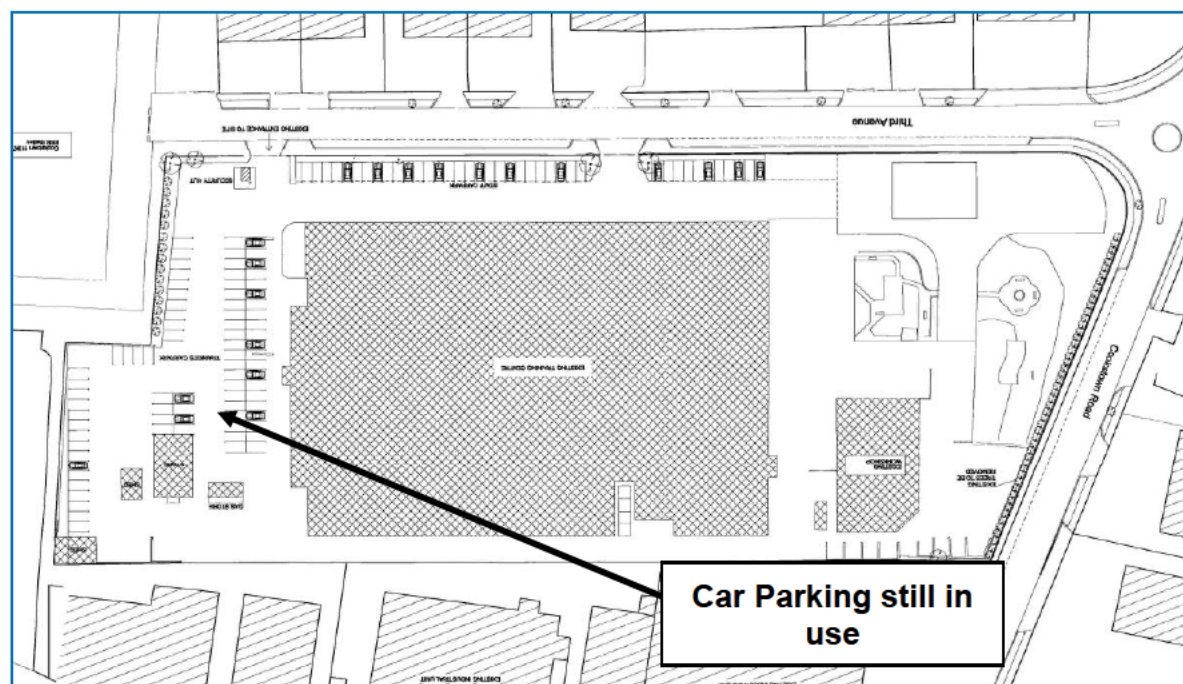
Permitted Site Layout Plan under Reg. Ref.: SD05A/0136
